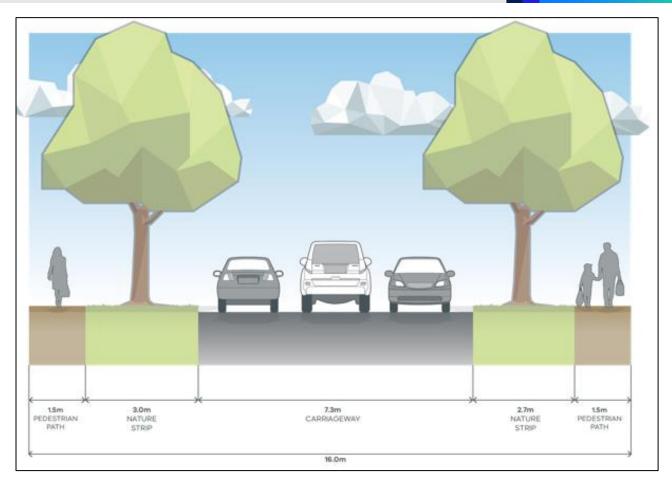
Local access street (level 1) cross section - 16m (Source: VPA)
